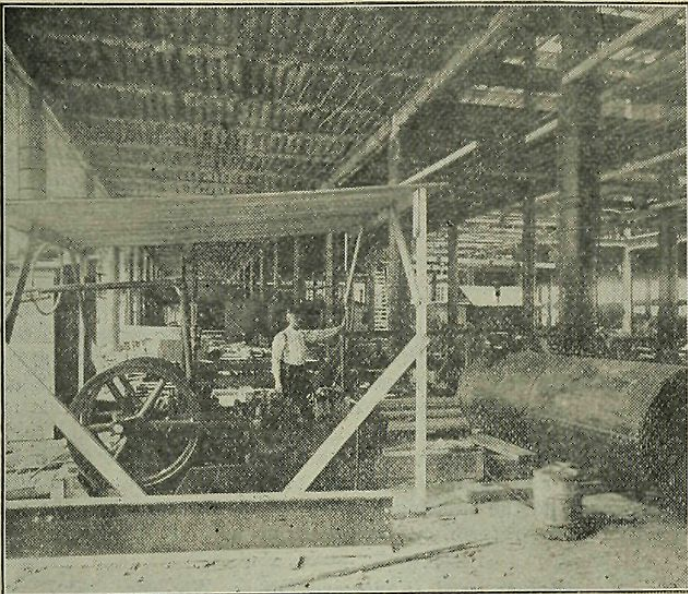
AIR-COMPRESSING PLANT IN MACY BUILDING.
